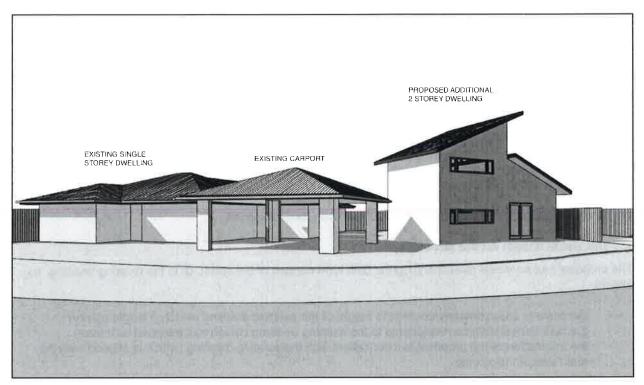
The proposed built form - 3D perspective view showing dominant scale of new dwelling
